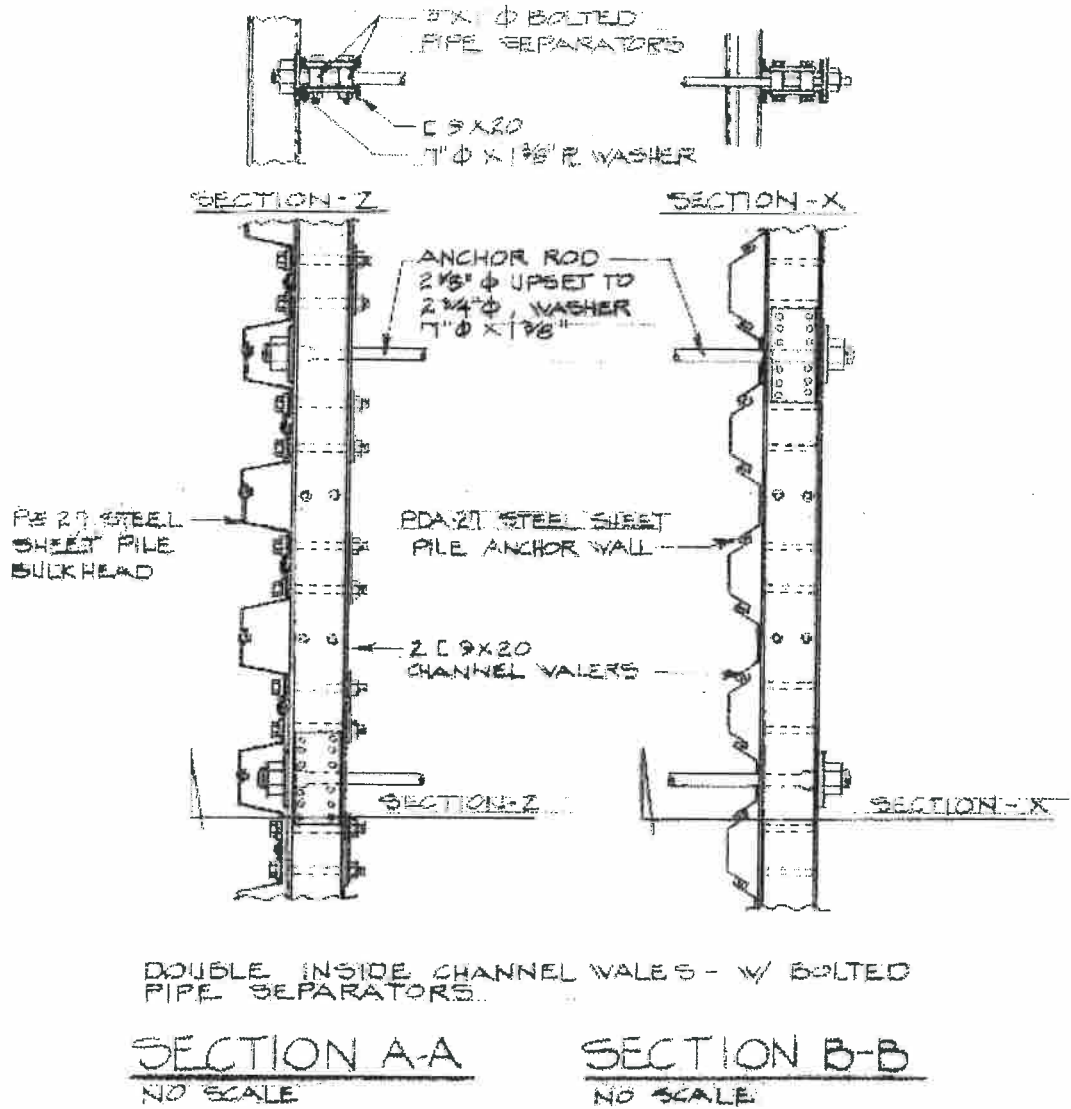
Typical Sheet Pile Connection Construction Detail
